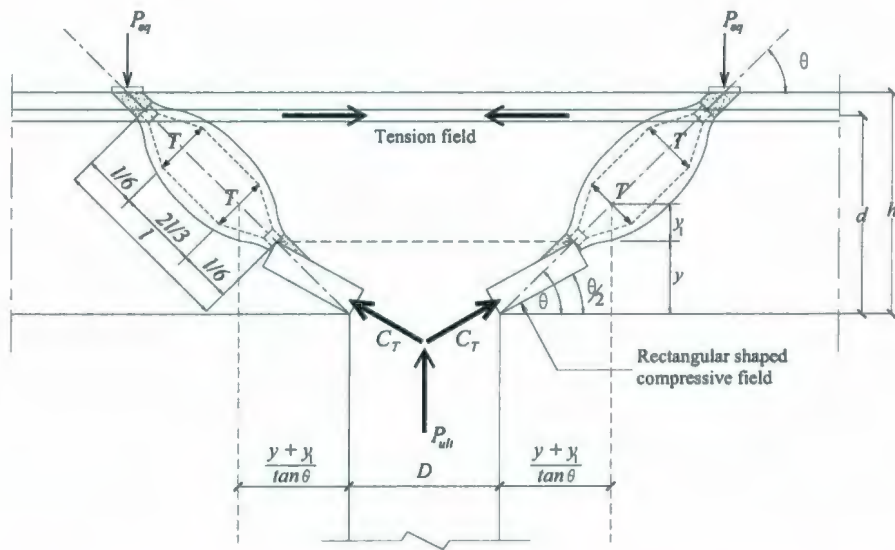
Refined strut and tie model for symmetric punching of concrete slab
